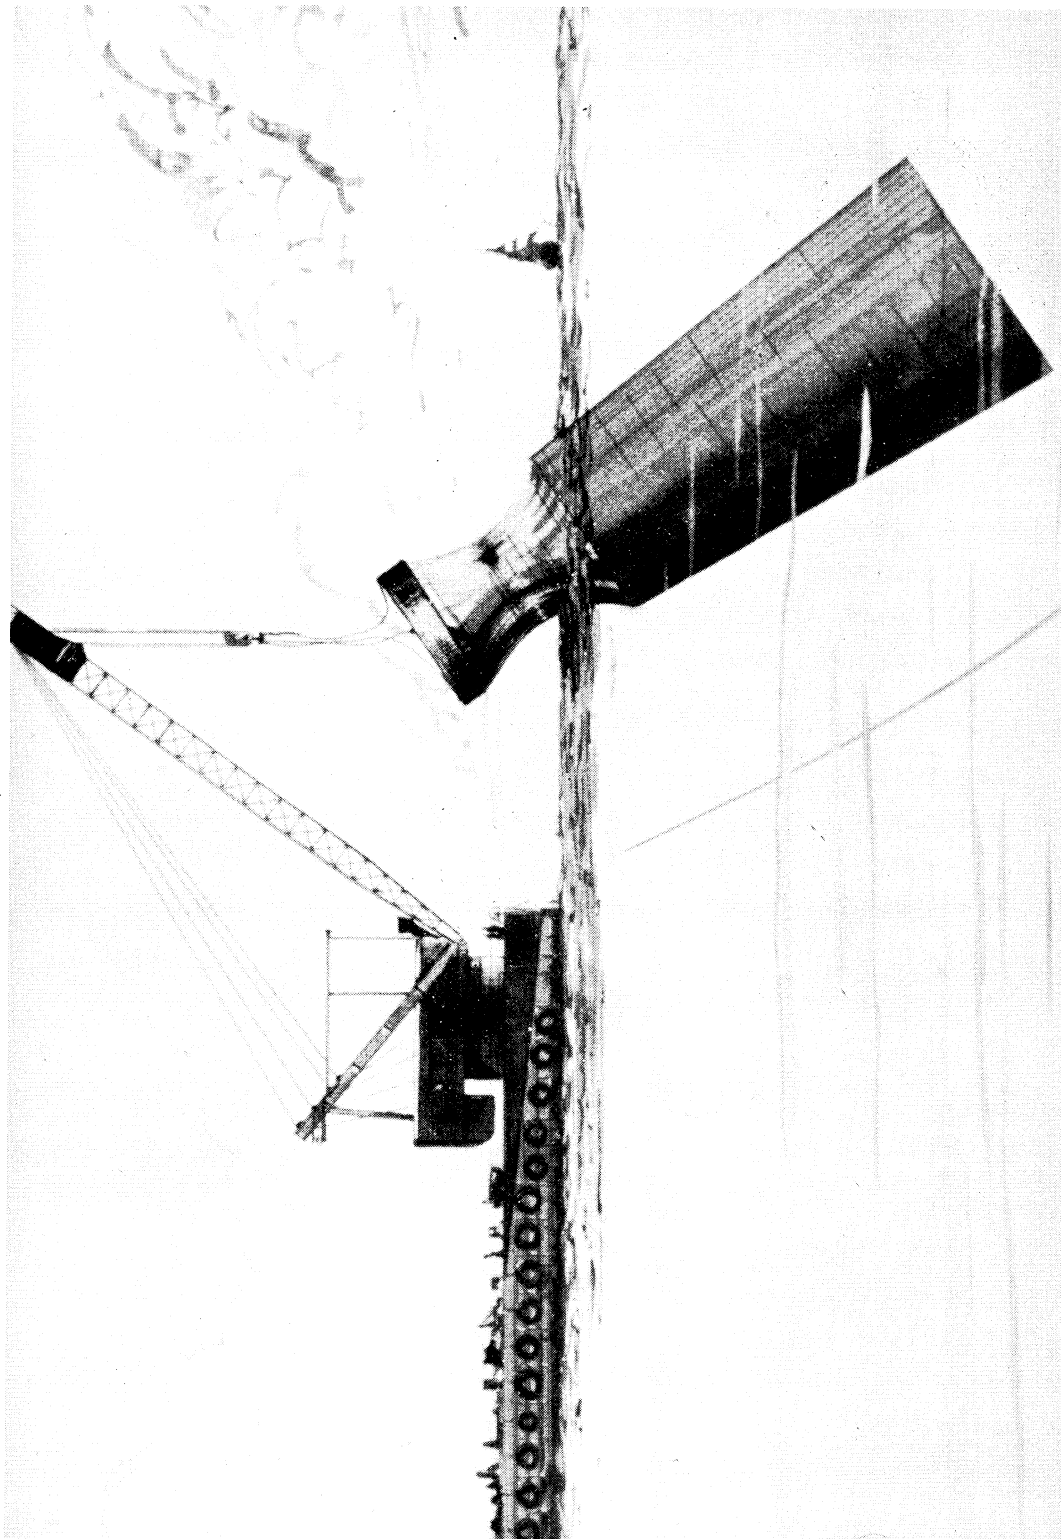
UP-ENDING OF CAISSON PIER FOR PROPOSED BERING STRAITS BRIDGE
